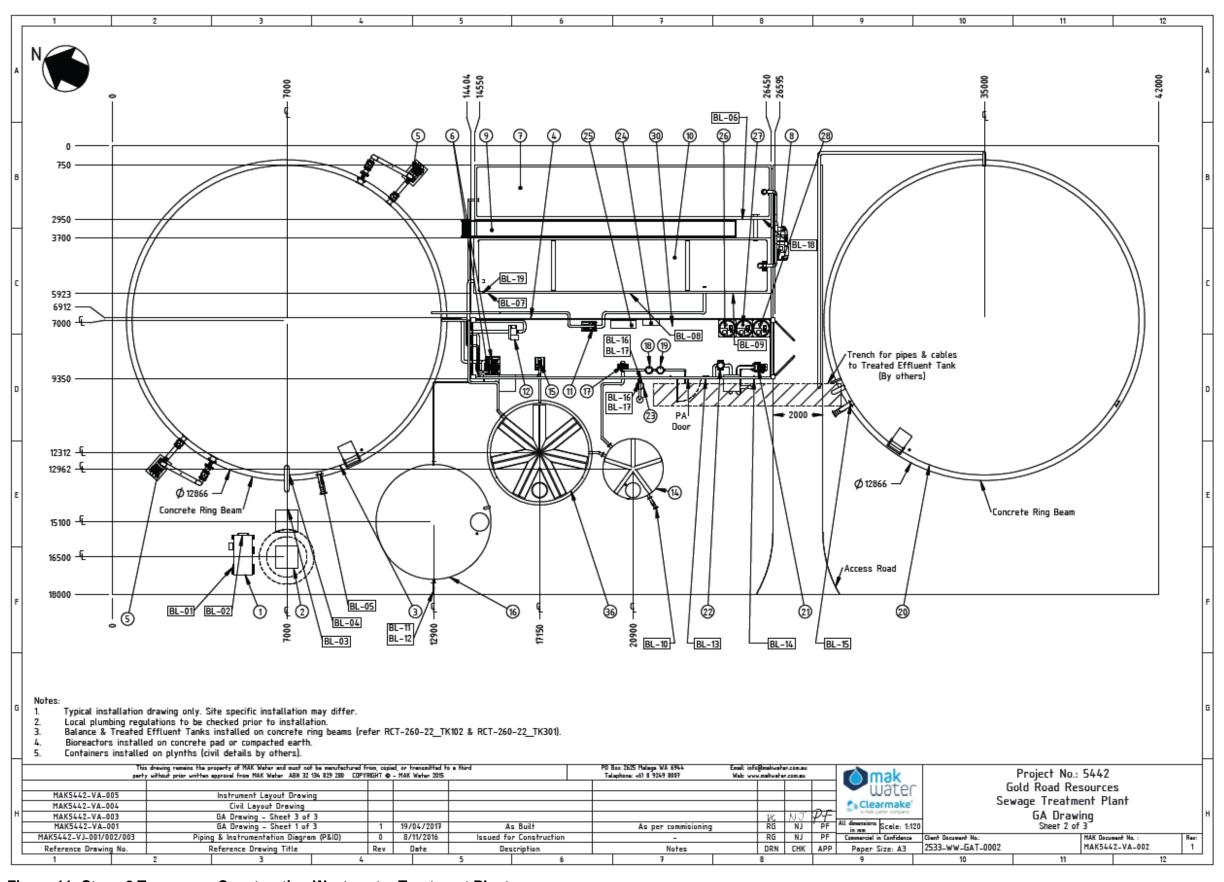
Stage 2 Temporary Construction Wastewater Treatment Plant
